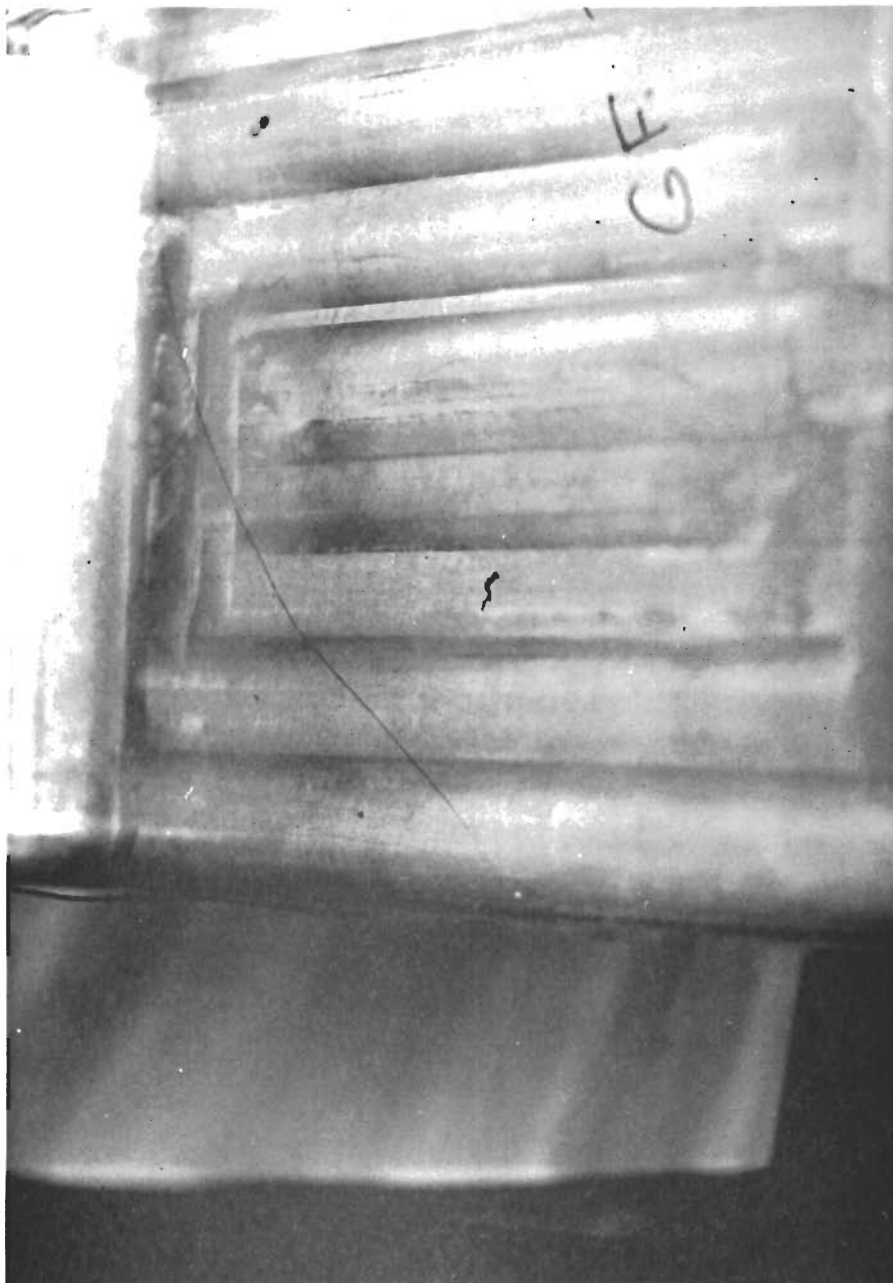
Buckling of Longitudinal Stiffener in Model No. 2, Transverse Loading.
